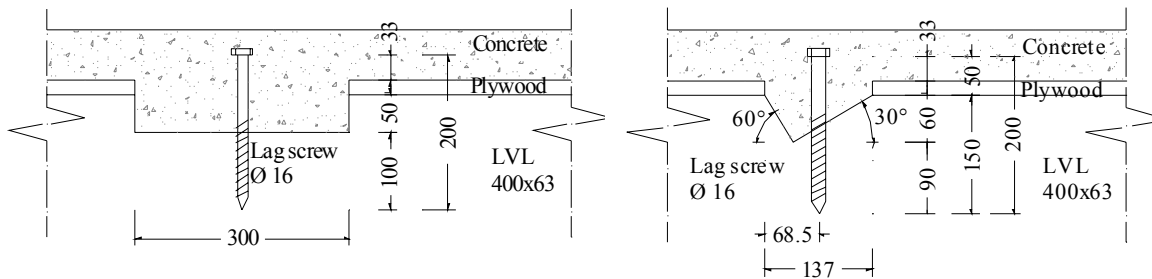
Details of the rectangular (left) and triangular (right) notched connections tested at the University of Canterbury (dimensions in mm) [7,18]
